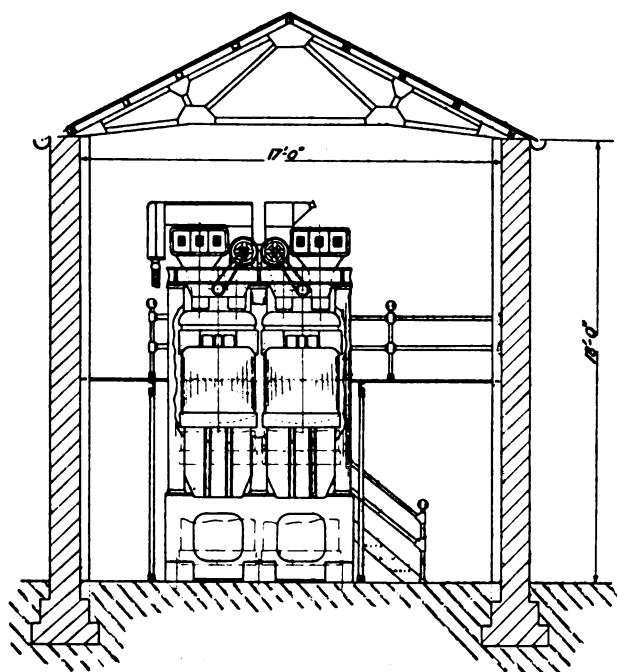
Heavy-duty metal-clad compound- or oil-filled switchgear unit, with double breakers.
